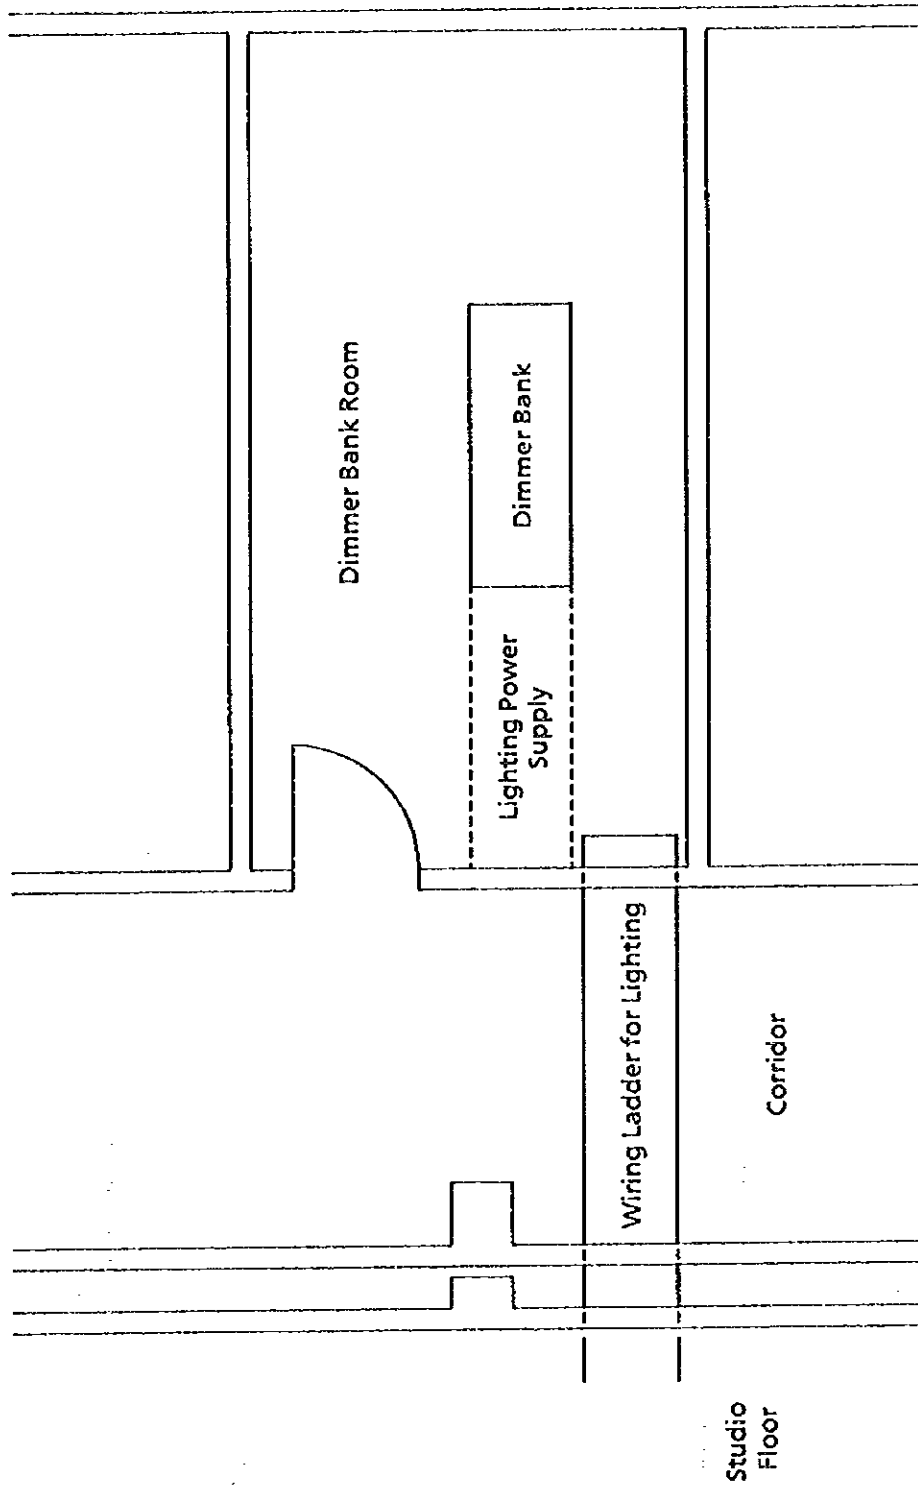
Equipment Layout of Dimmer Bank Room
